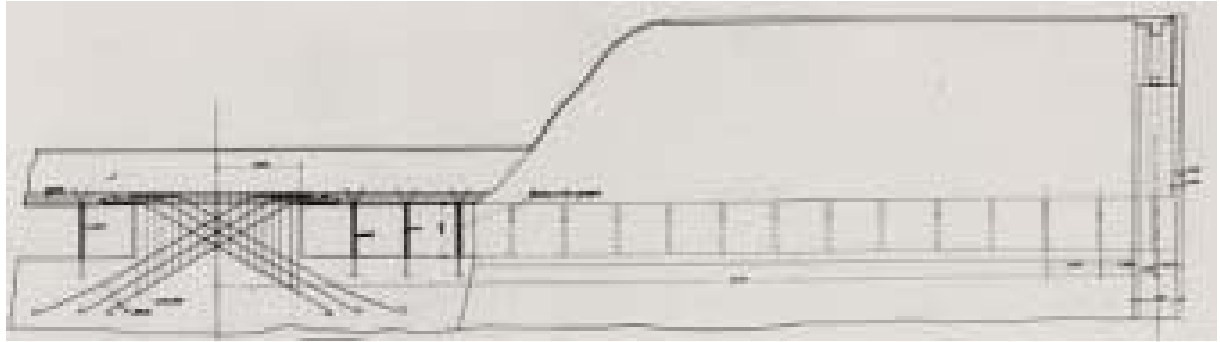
Construction drawing of the real supports at the generators of half section.* The central section was fixed with anchor bars in two directions. The rest of the generators were connected by small beams separated 1.5 metres.
